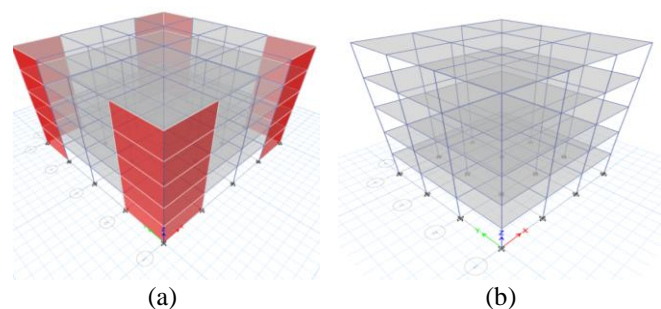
3D view of 5storey model (a) with and (b) without shear wall
